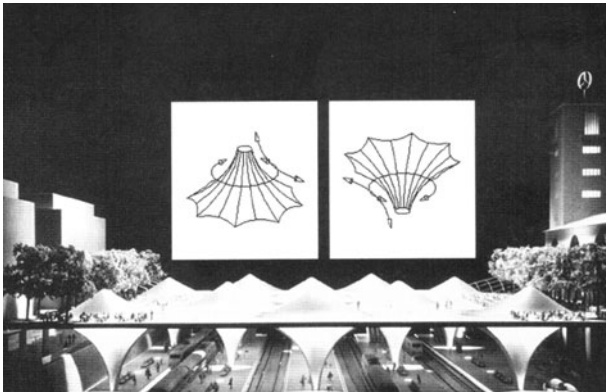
Stuttgart 21 project, new railway station roof made of concrete shells formed with tensile membranes [16]
